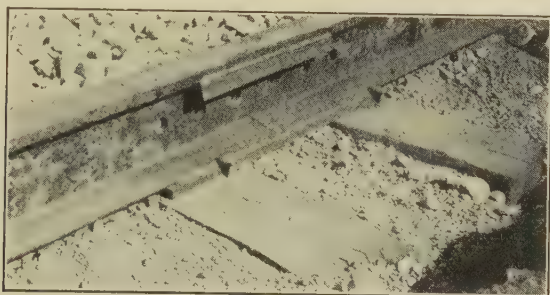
Base-plate, head-bar joint installed on 7-in. rail.
